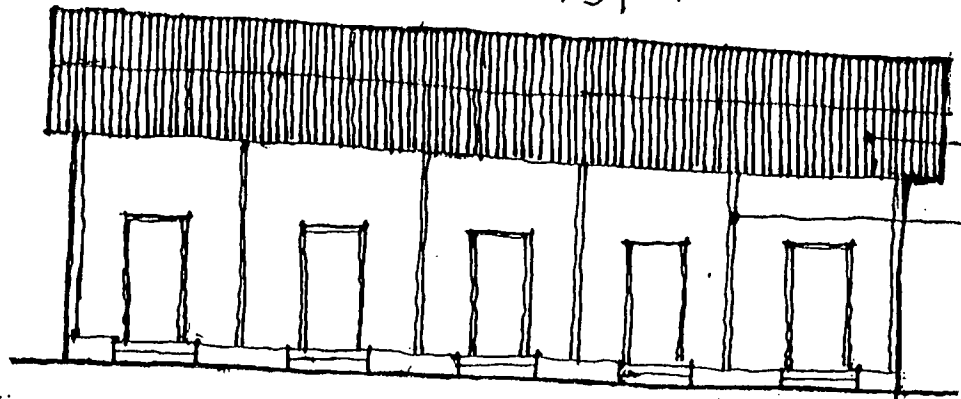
Front elevation, Methor's patti, Nazira bazar, Dhaka
